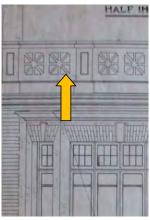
Original elevation drawing showing the roof parapet Roman lattice motif.
